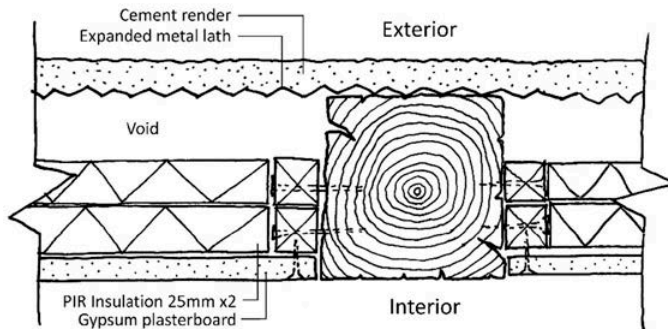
Sketch plan detail of replacement panel infill at case study. Source: Author's own, 2017.
